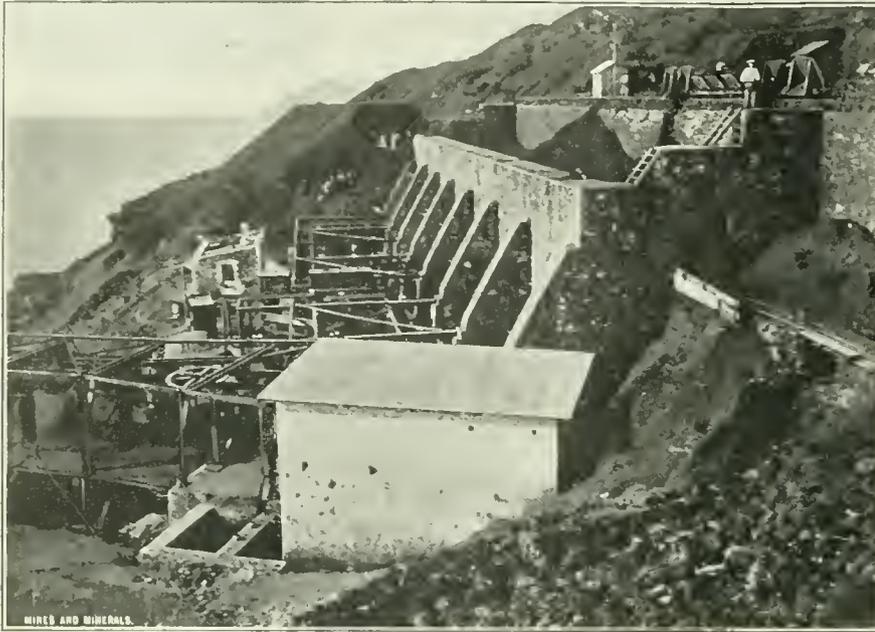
ORE HOPPER AND LOADING STATION FOR TRAMWAY
